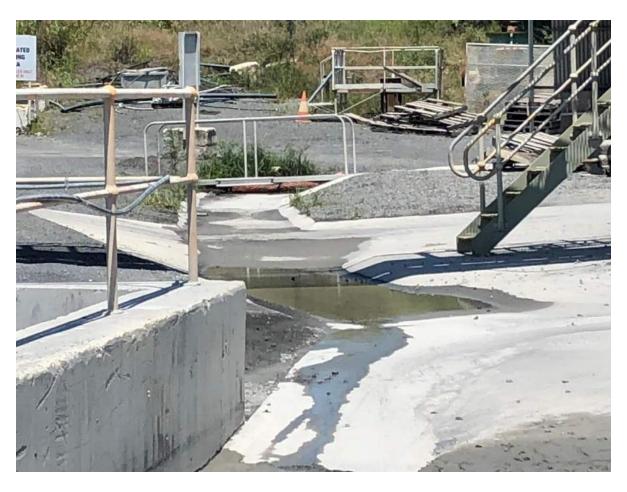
Stockpile Area #2 – view to south. Main Drainage Channel to right of photograph.
